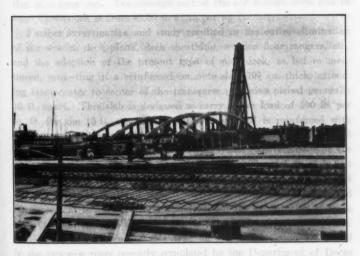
Tension Reinforcement and Templates for Holding in Position.
